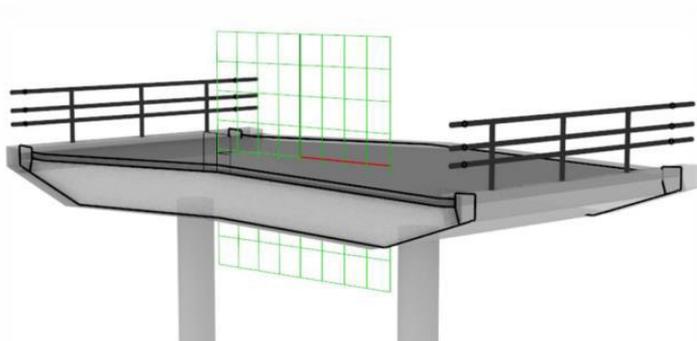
Bridge deck cross-section as an example of a local bridge modelling plane
